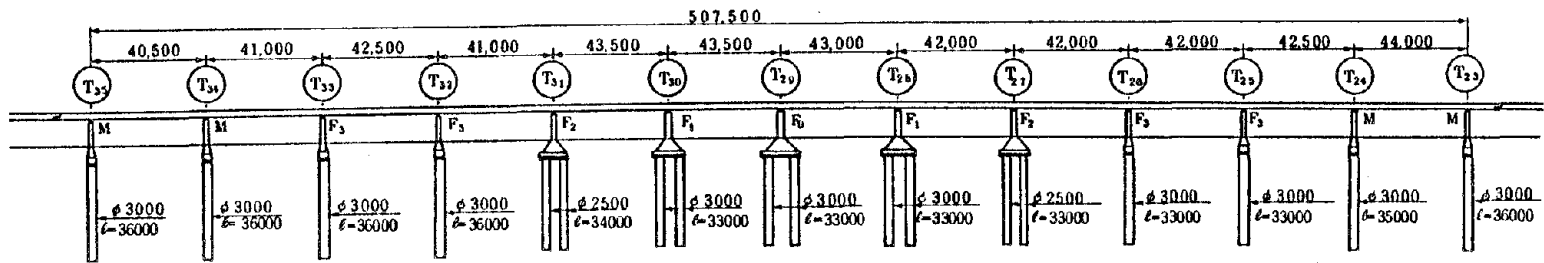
A Continuous Girder Bridge in Metropolitan Expressway
